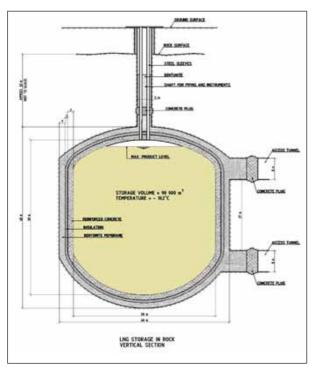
Vertical cross-section of underground storage of LNG developed by Norconsult AS. (Illustration: Norconsult)
